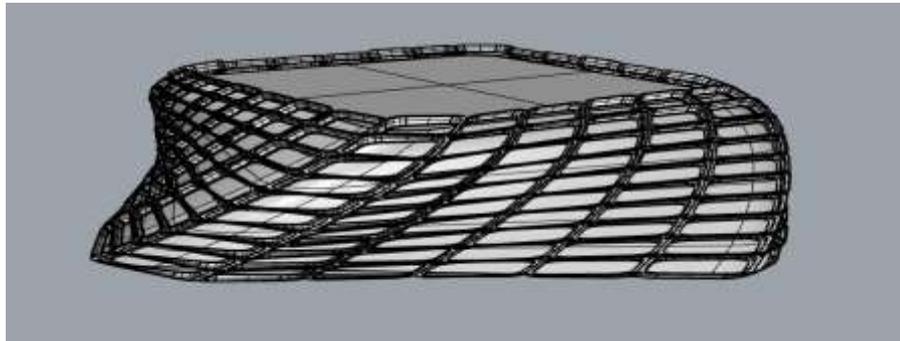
Layout 1- Square Shaped Plan Building, Parametric Curvilinear Form
